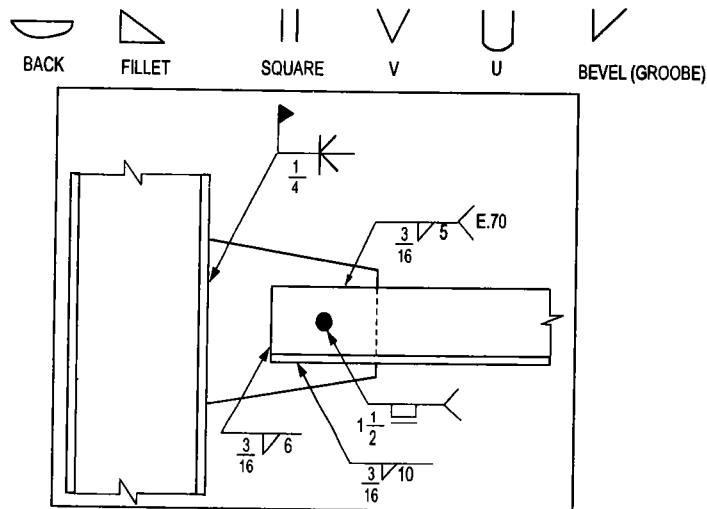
Standard symbols of welds and an example of weld connection drawing
